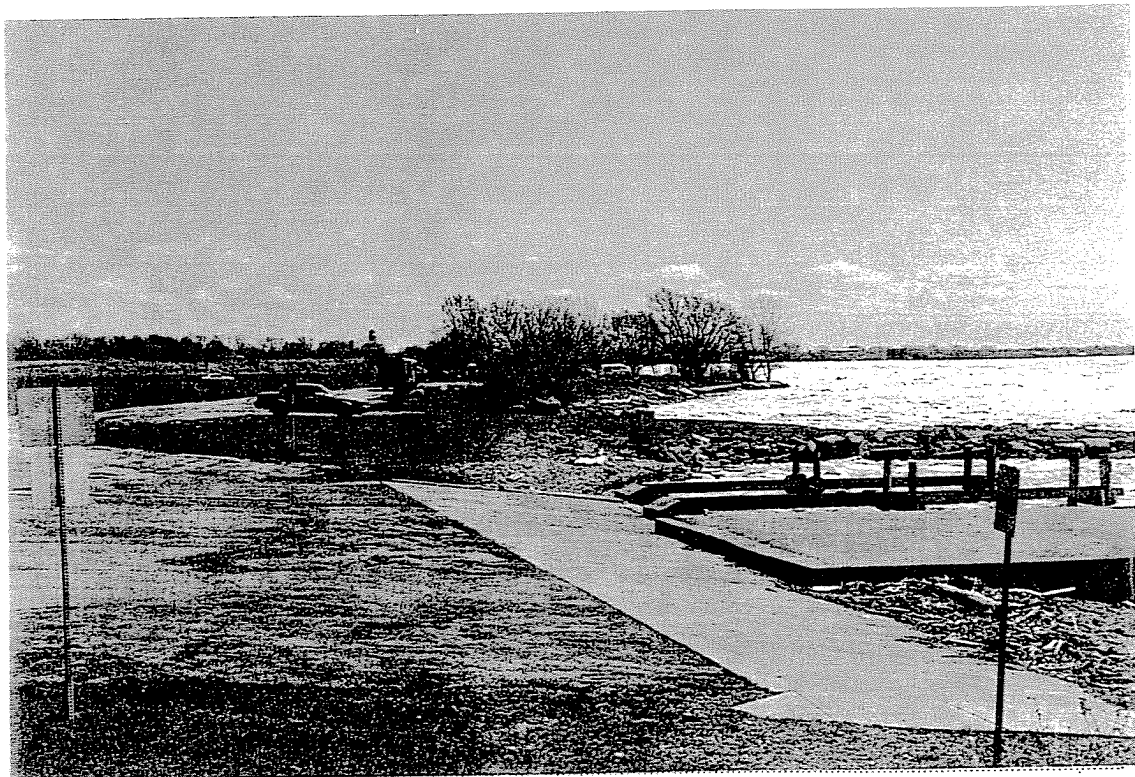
Park shoreline and boat ramps facing southeast from a point just west of the ramps and 50 ft from shore.
